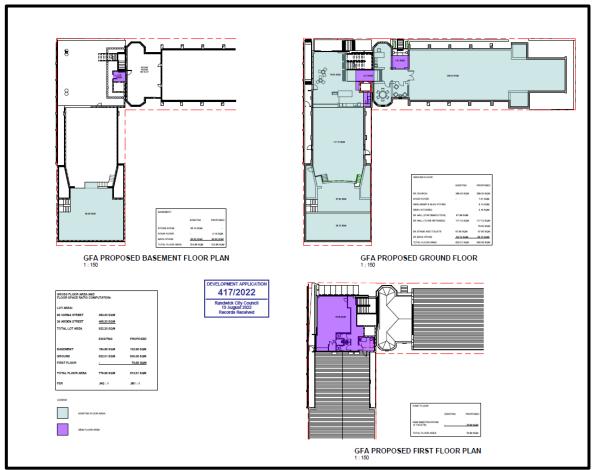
Applicant's GFA Diagrams (Source: Architectural Plans).
